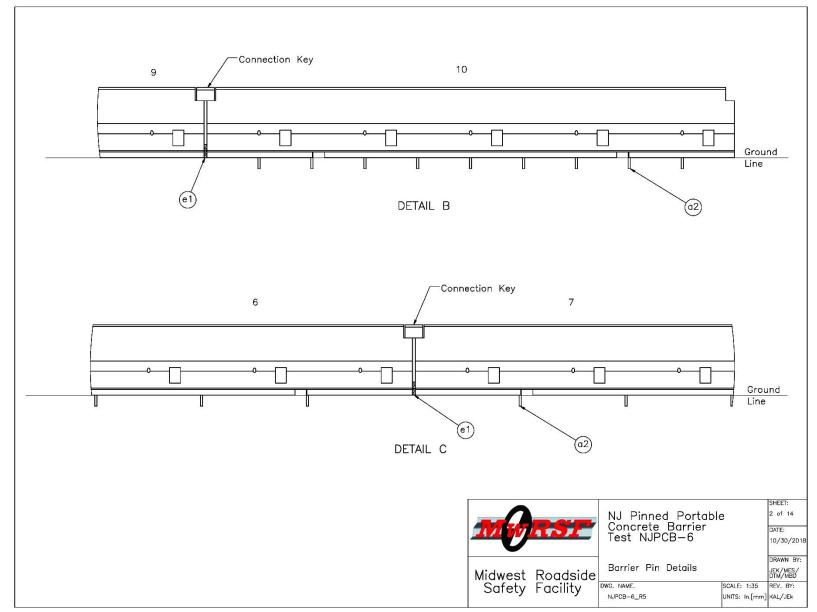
PCB Pin Anchor Details, Test No. NJPCB-6
